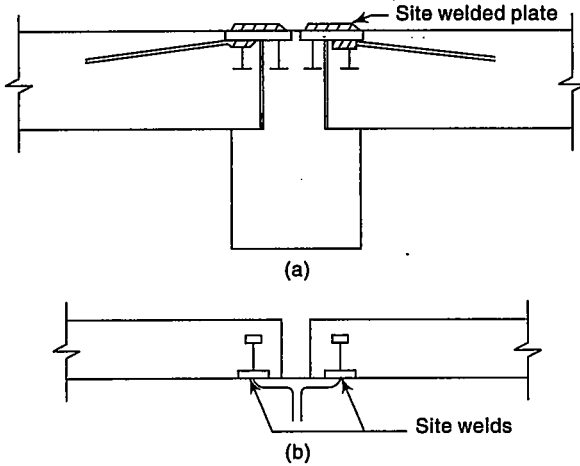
Connections between precast slab (a) connection of a precast slab to a concrete beam (b) connection of a precast slab to a steel beam
